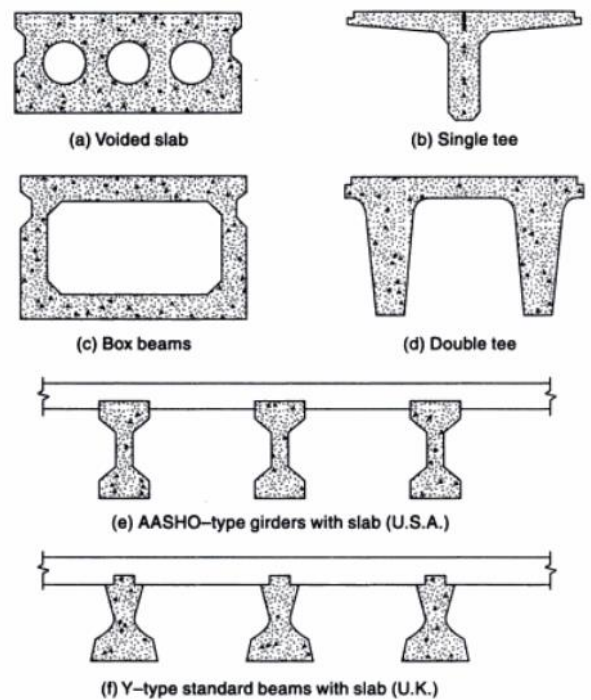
Typical Cross-Sections of Pre-tensioned Prestressed
